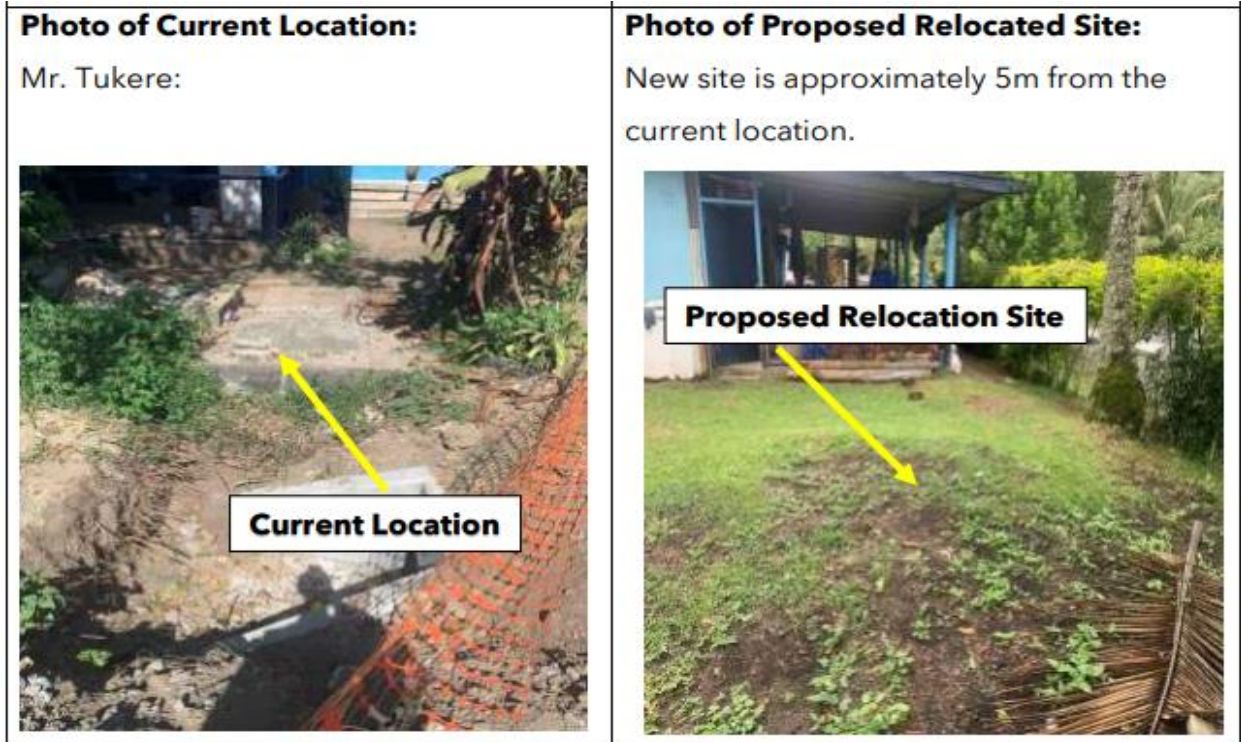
Picture of 2nd House Septic Tank & Proposed Relocation site
